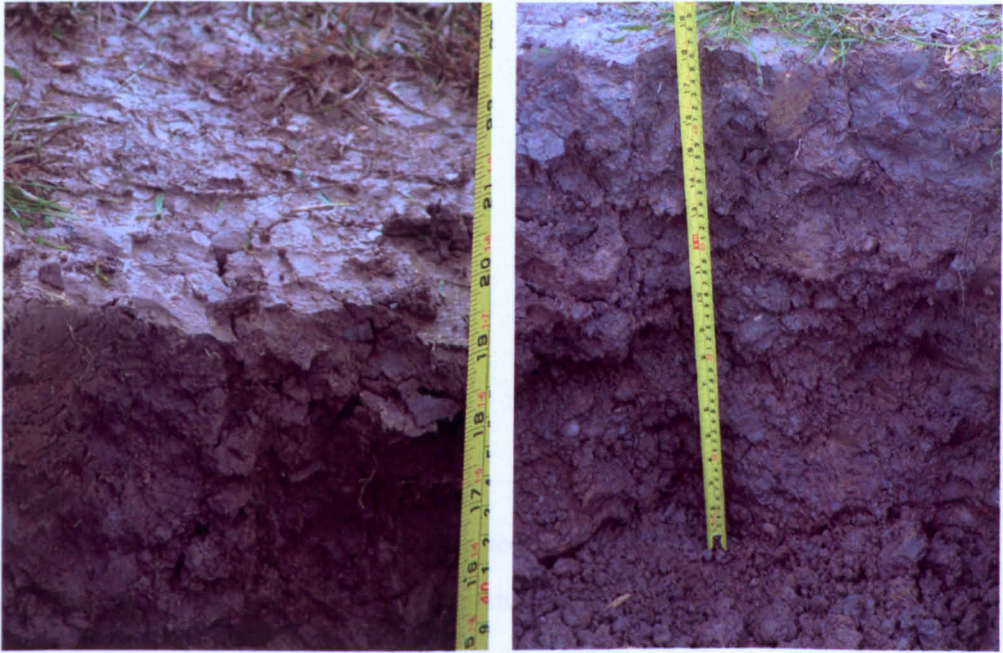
Photographs of hand excavated trial pit showing the network of desiccation fissures beneath the crest of the new embankment (2006).
